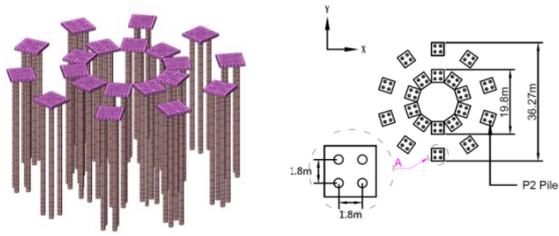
FE layout and bird view of the pile foundations in case study No.2
